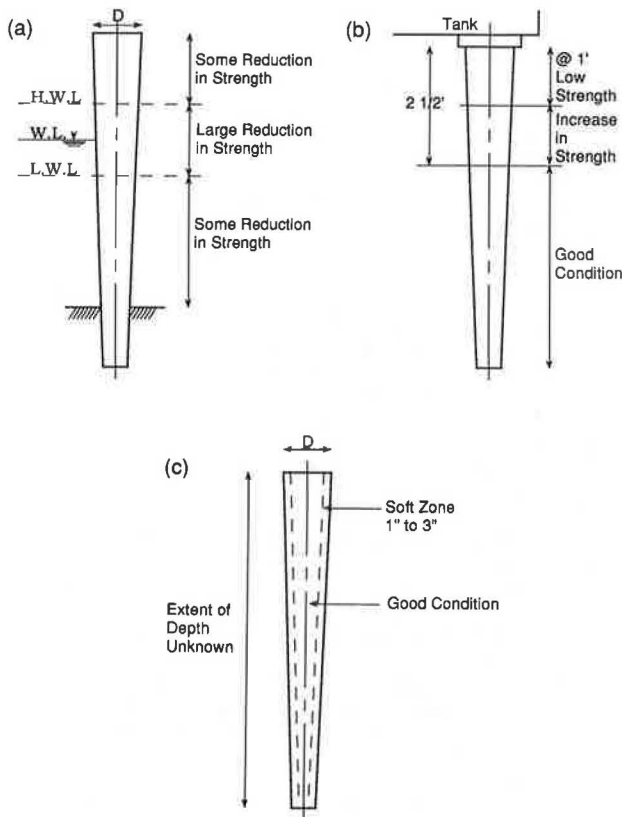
Types of deterioration of timber piles: (a) piles supporting bridges, (b) piles supporting tanks, and (c) piles supporting buildings.
